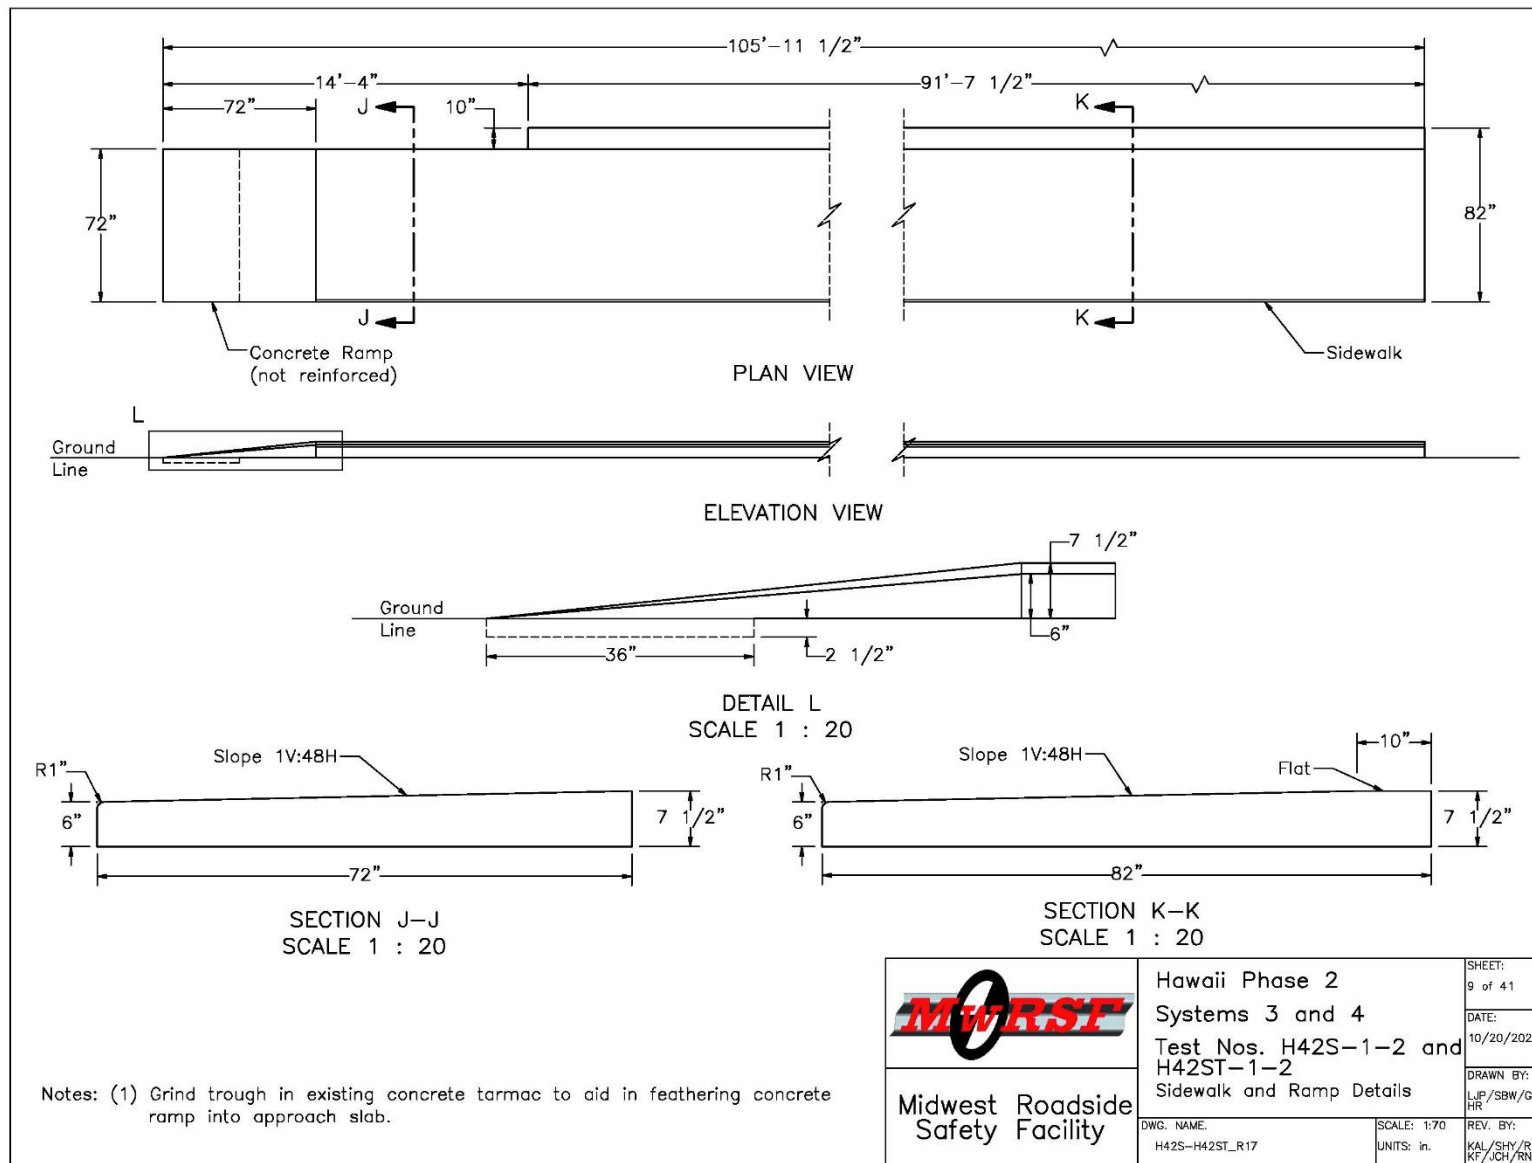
Sidewalk and Ramp Details, Test Nos. H42S-1 and H42S-2
